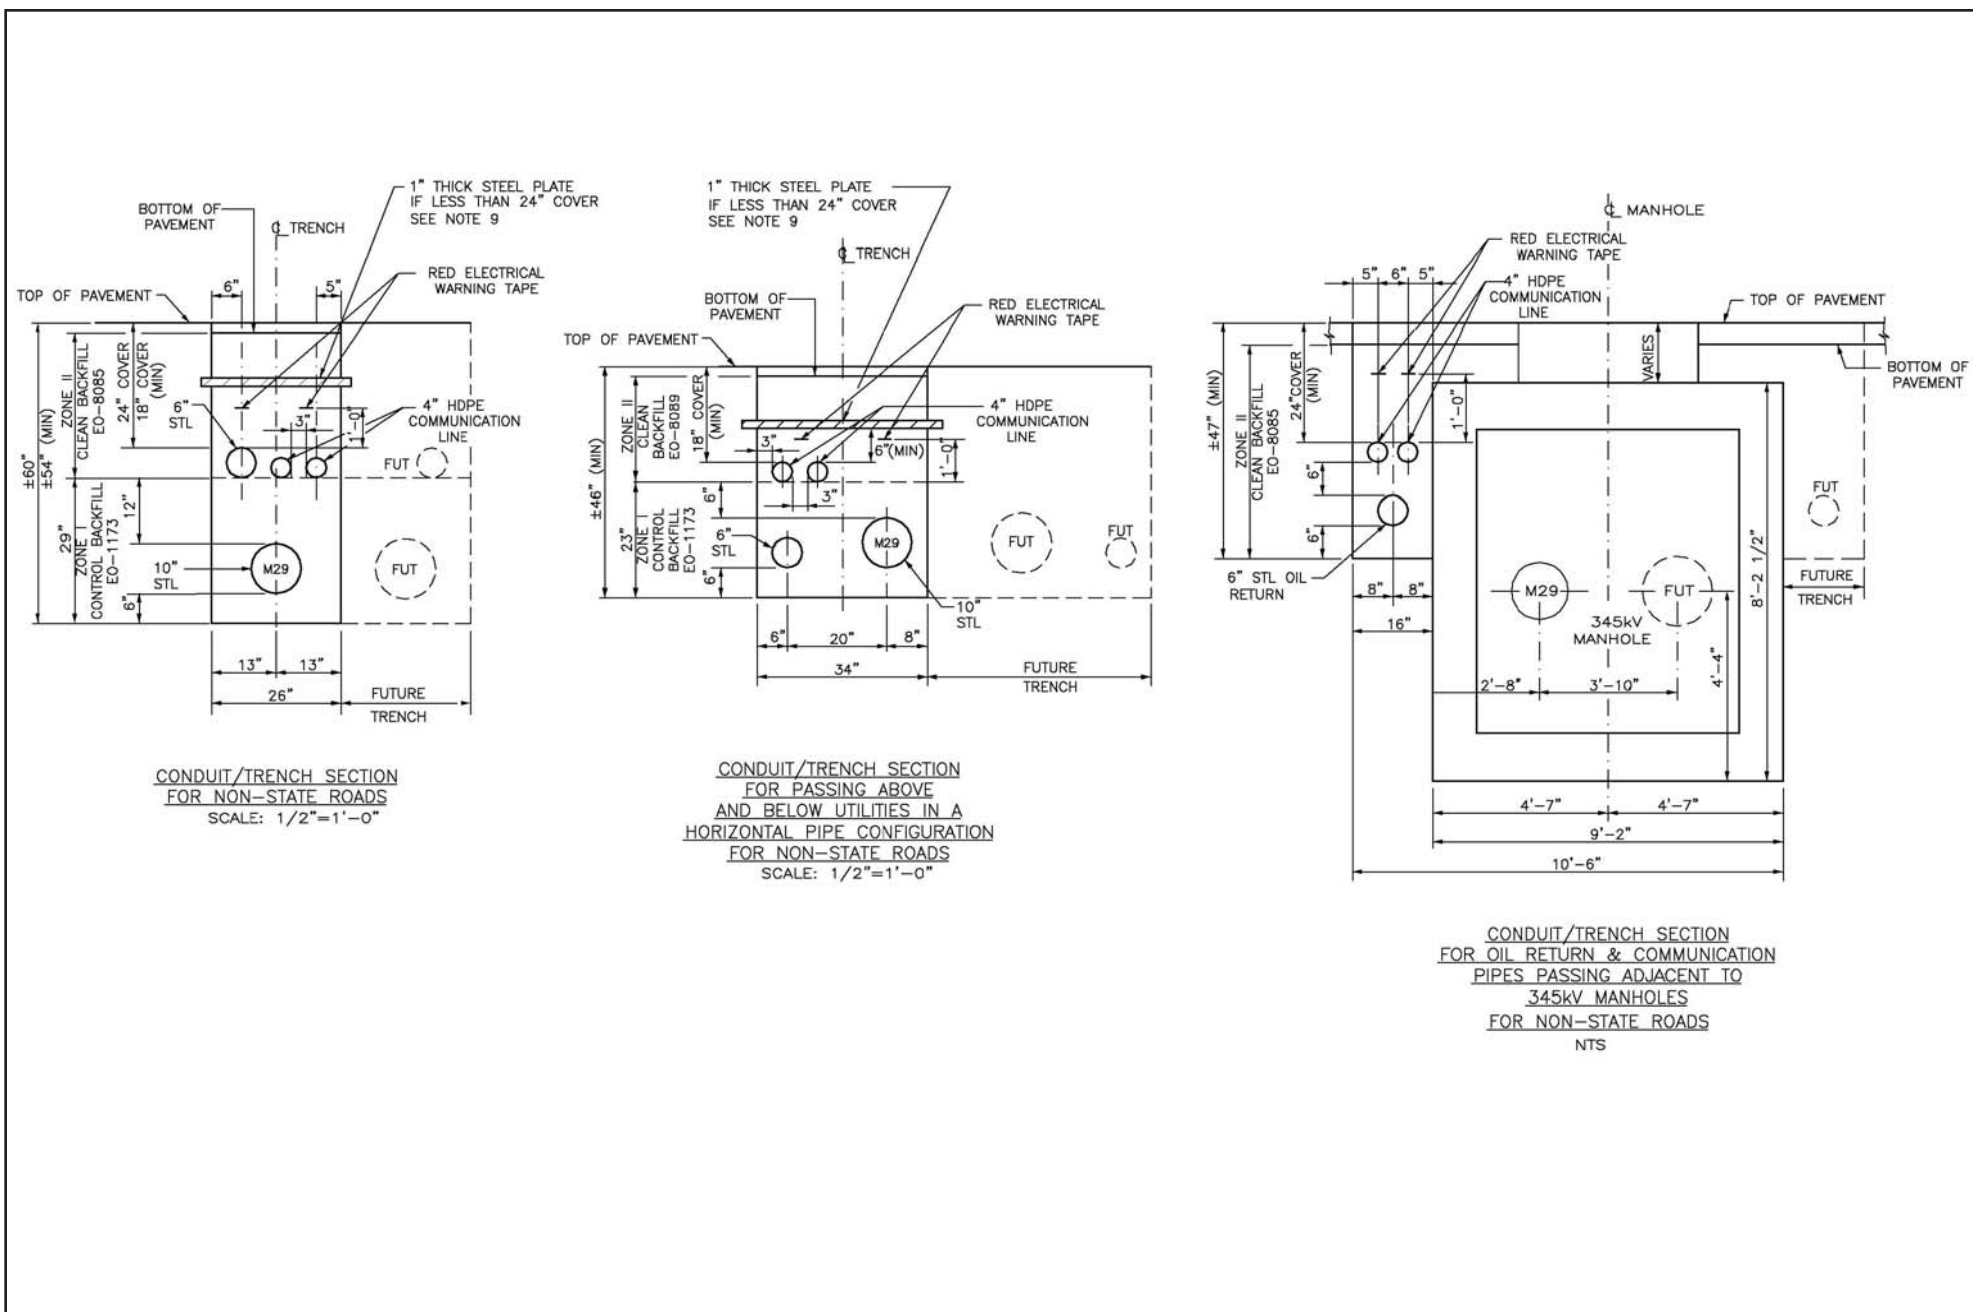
Cross-section: typical pipe-type trench dimensions for the M29 Cable in the City of New York.
